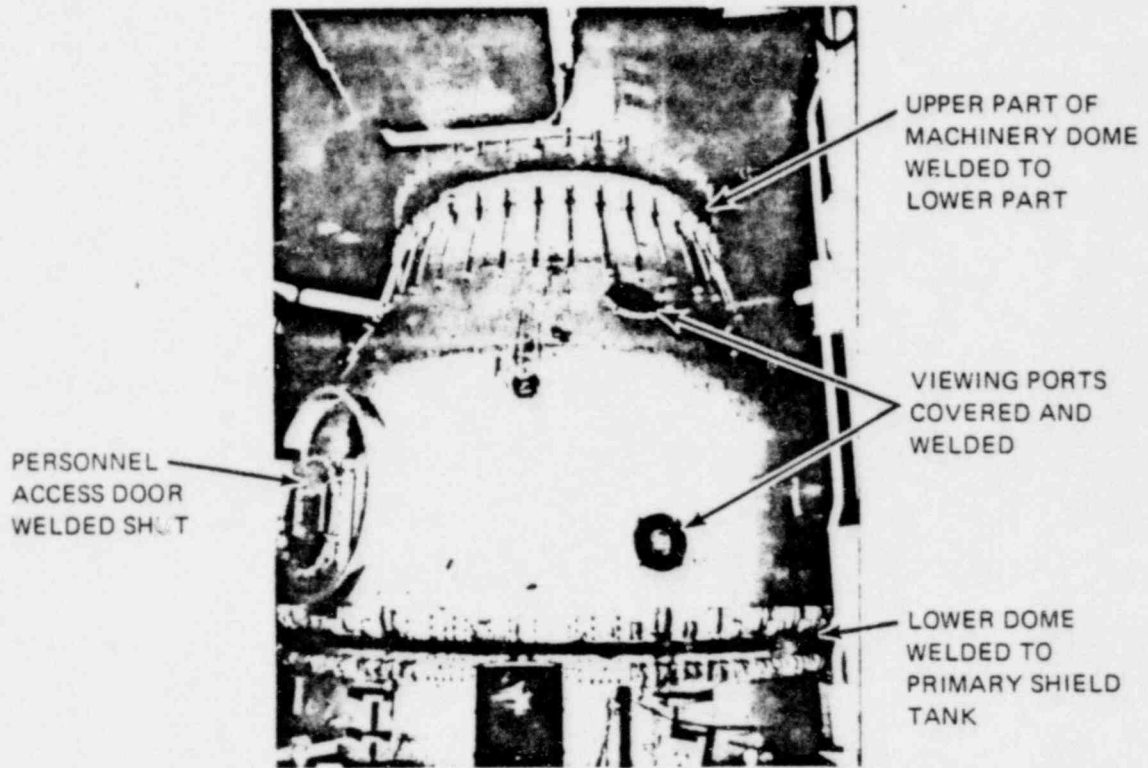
MACHINERY DOME COMPLETELY SEAL-WELDED
